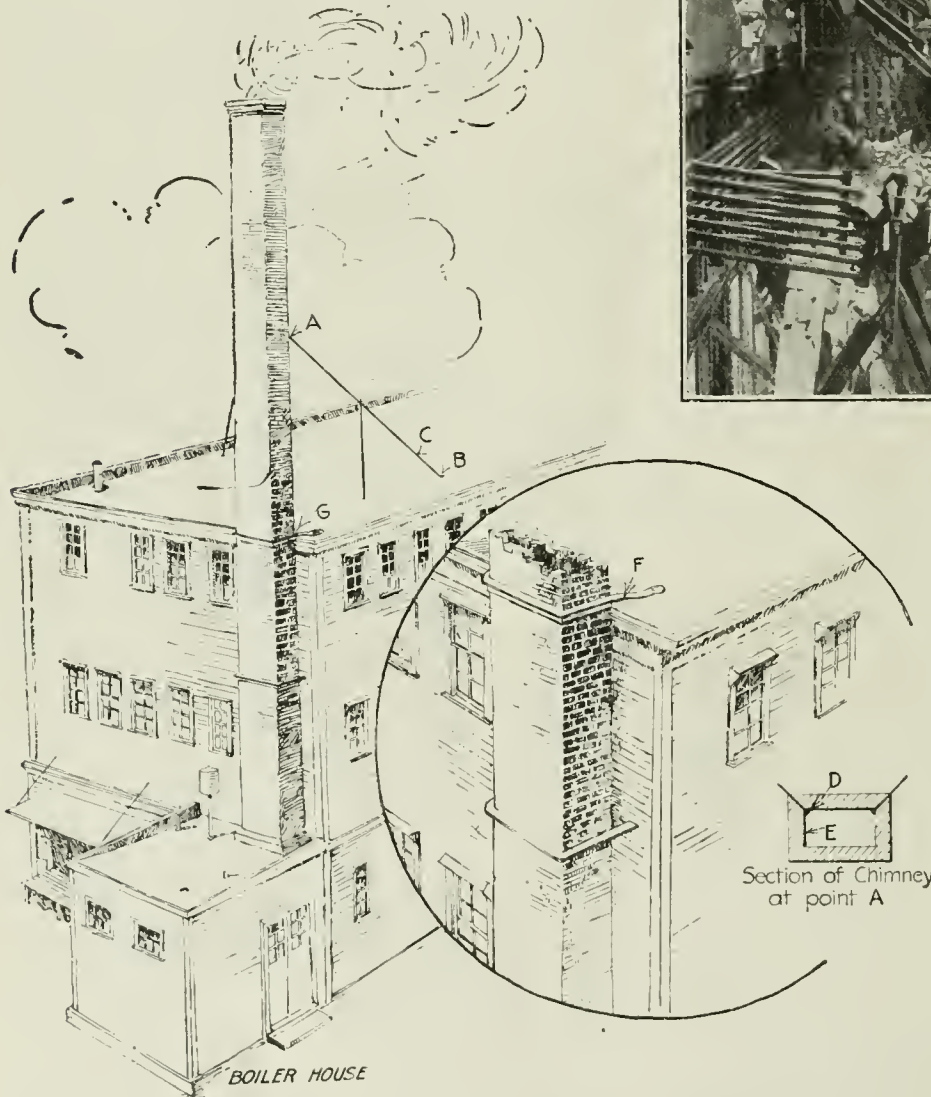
DETAILS OF THE CHIMNEY, METHOD OF BRACING AND POINT OF FAILURE
